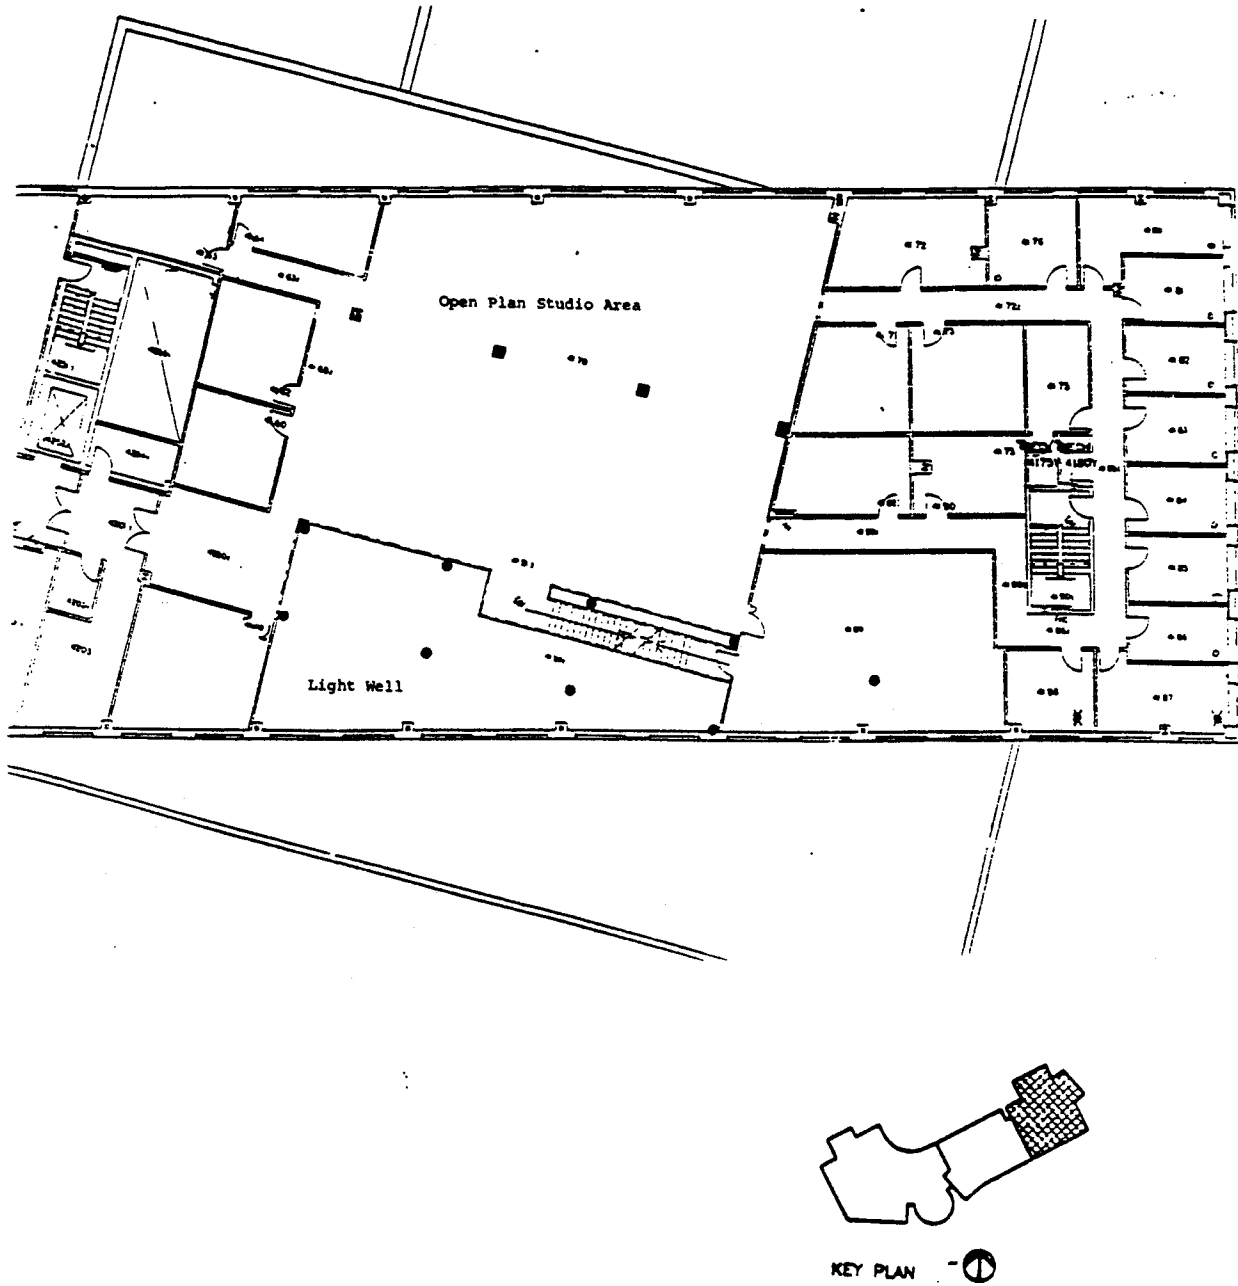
Plan of fourth floor of Professional Faculties Building showing the open plan studio area.
